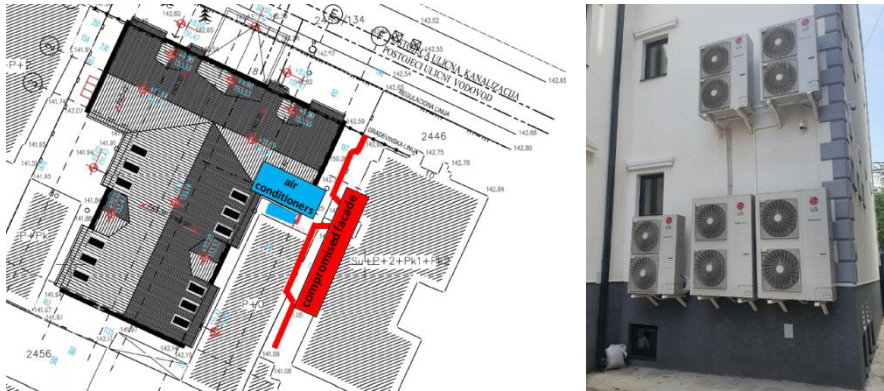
General plan with the position of the office building where the air conditioners are located and affected endangered facades of the residential building (left) and a photo of the courtyard facade of the office building (right)
